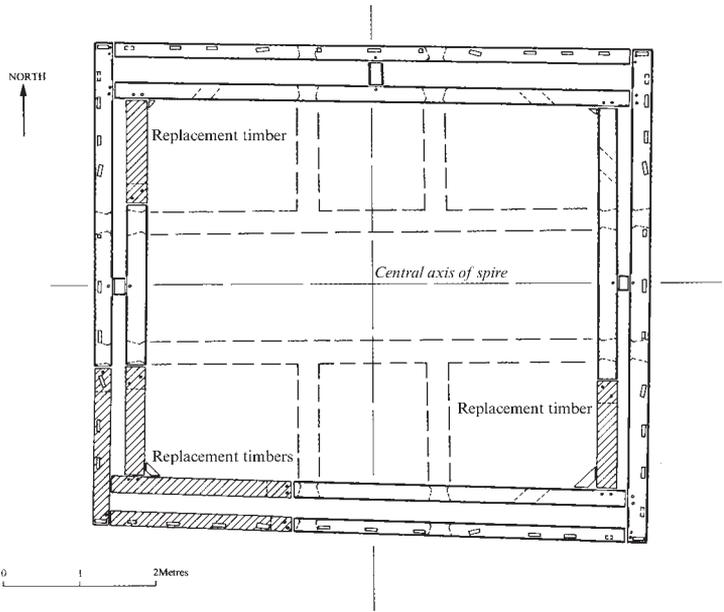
Plan showing the wall-plates & ties. Replacement sections of original timbers are shown hatched diagonally.
